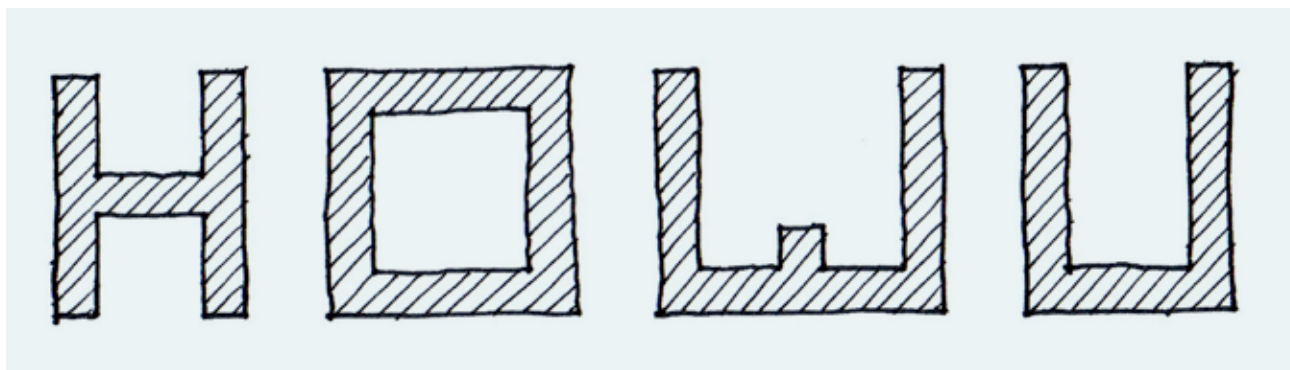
EXAMPLES OF BUILDING PLANS WITH GOOD ACCESS TO NATURAL LIGHT AND WITH GOOD POTENTIAL FOR NATURAL VENTILATION
